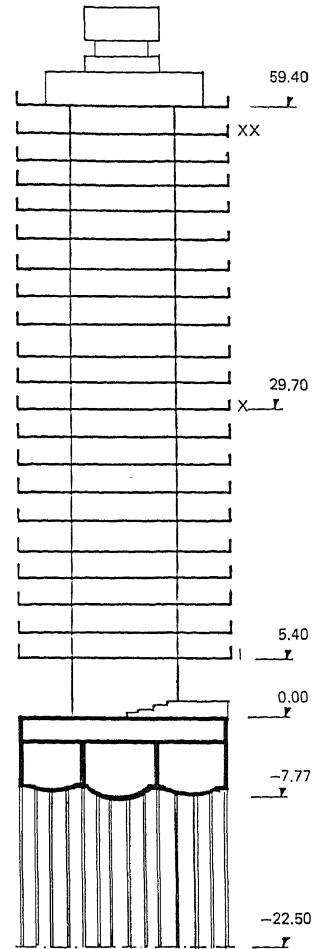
Scheme of the Cross Section of 22 Story Building - Type M, Tlatelolco, Mexico D.F.
